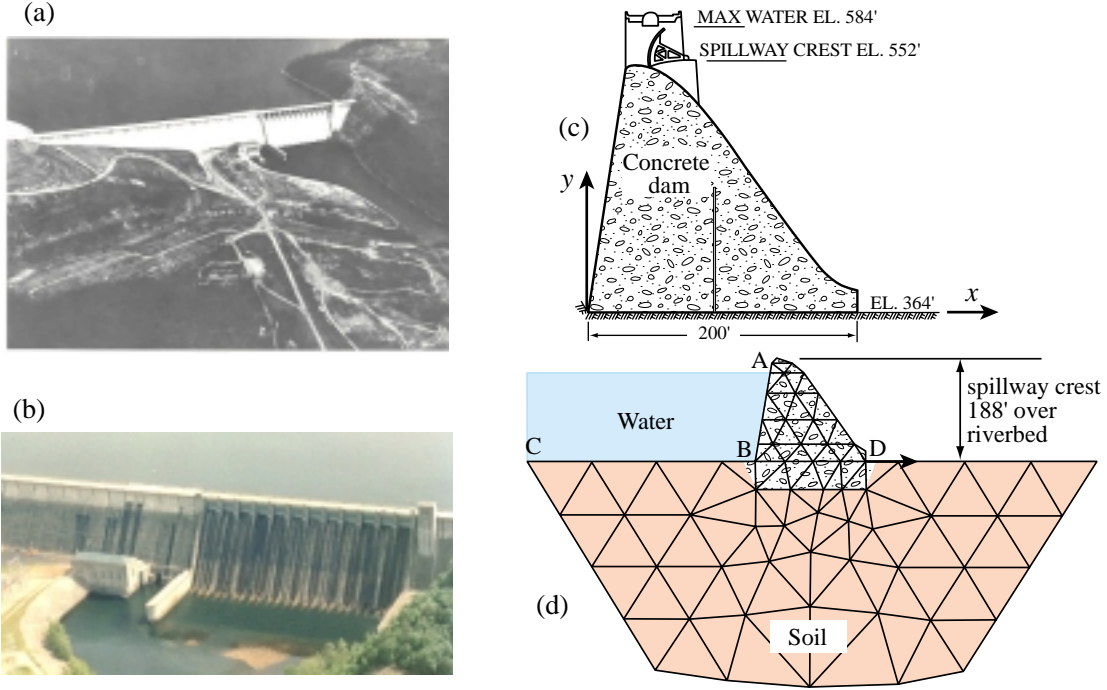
Norfolk Dam: (a,b) pictures; (c) cross section of dam above foundation (line inside dam is a thermally induced crack considered in the 1960 study); (d) coarse mesh including foundation and soil but not crack [146].
